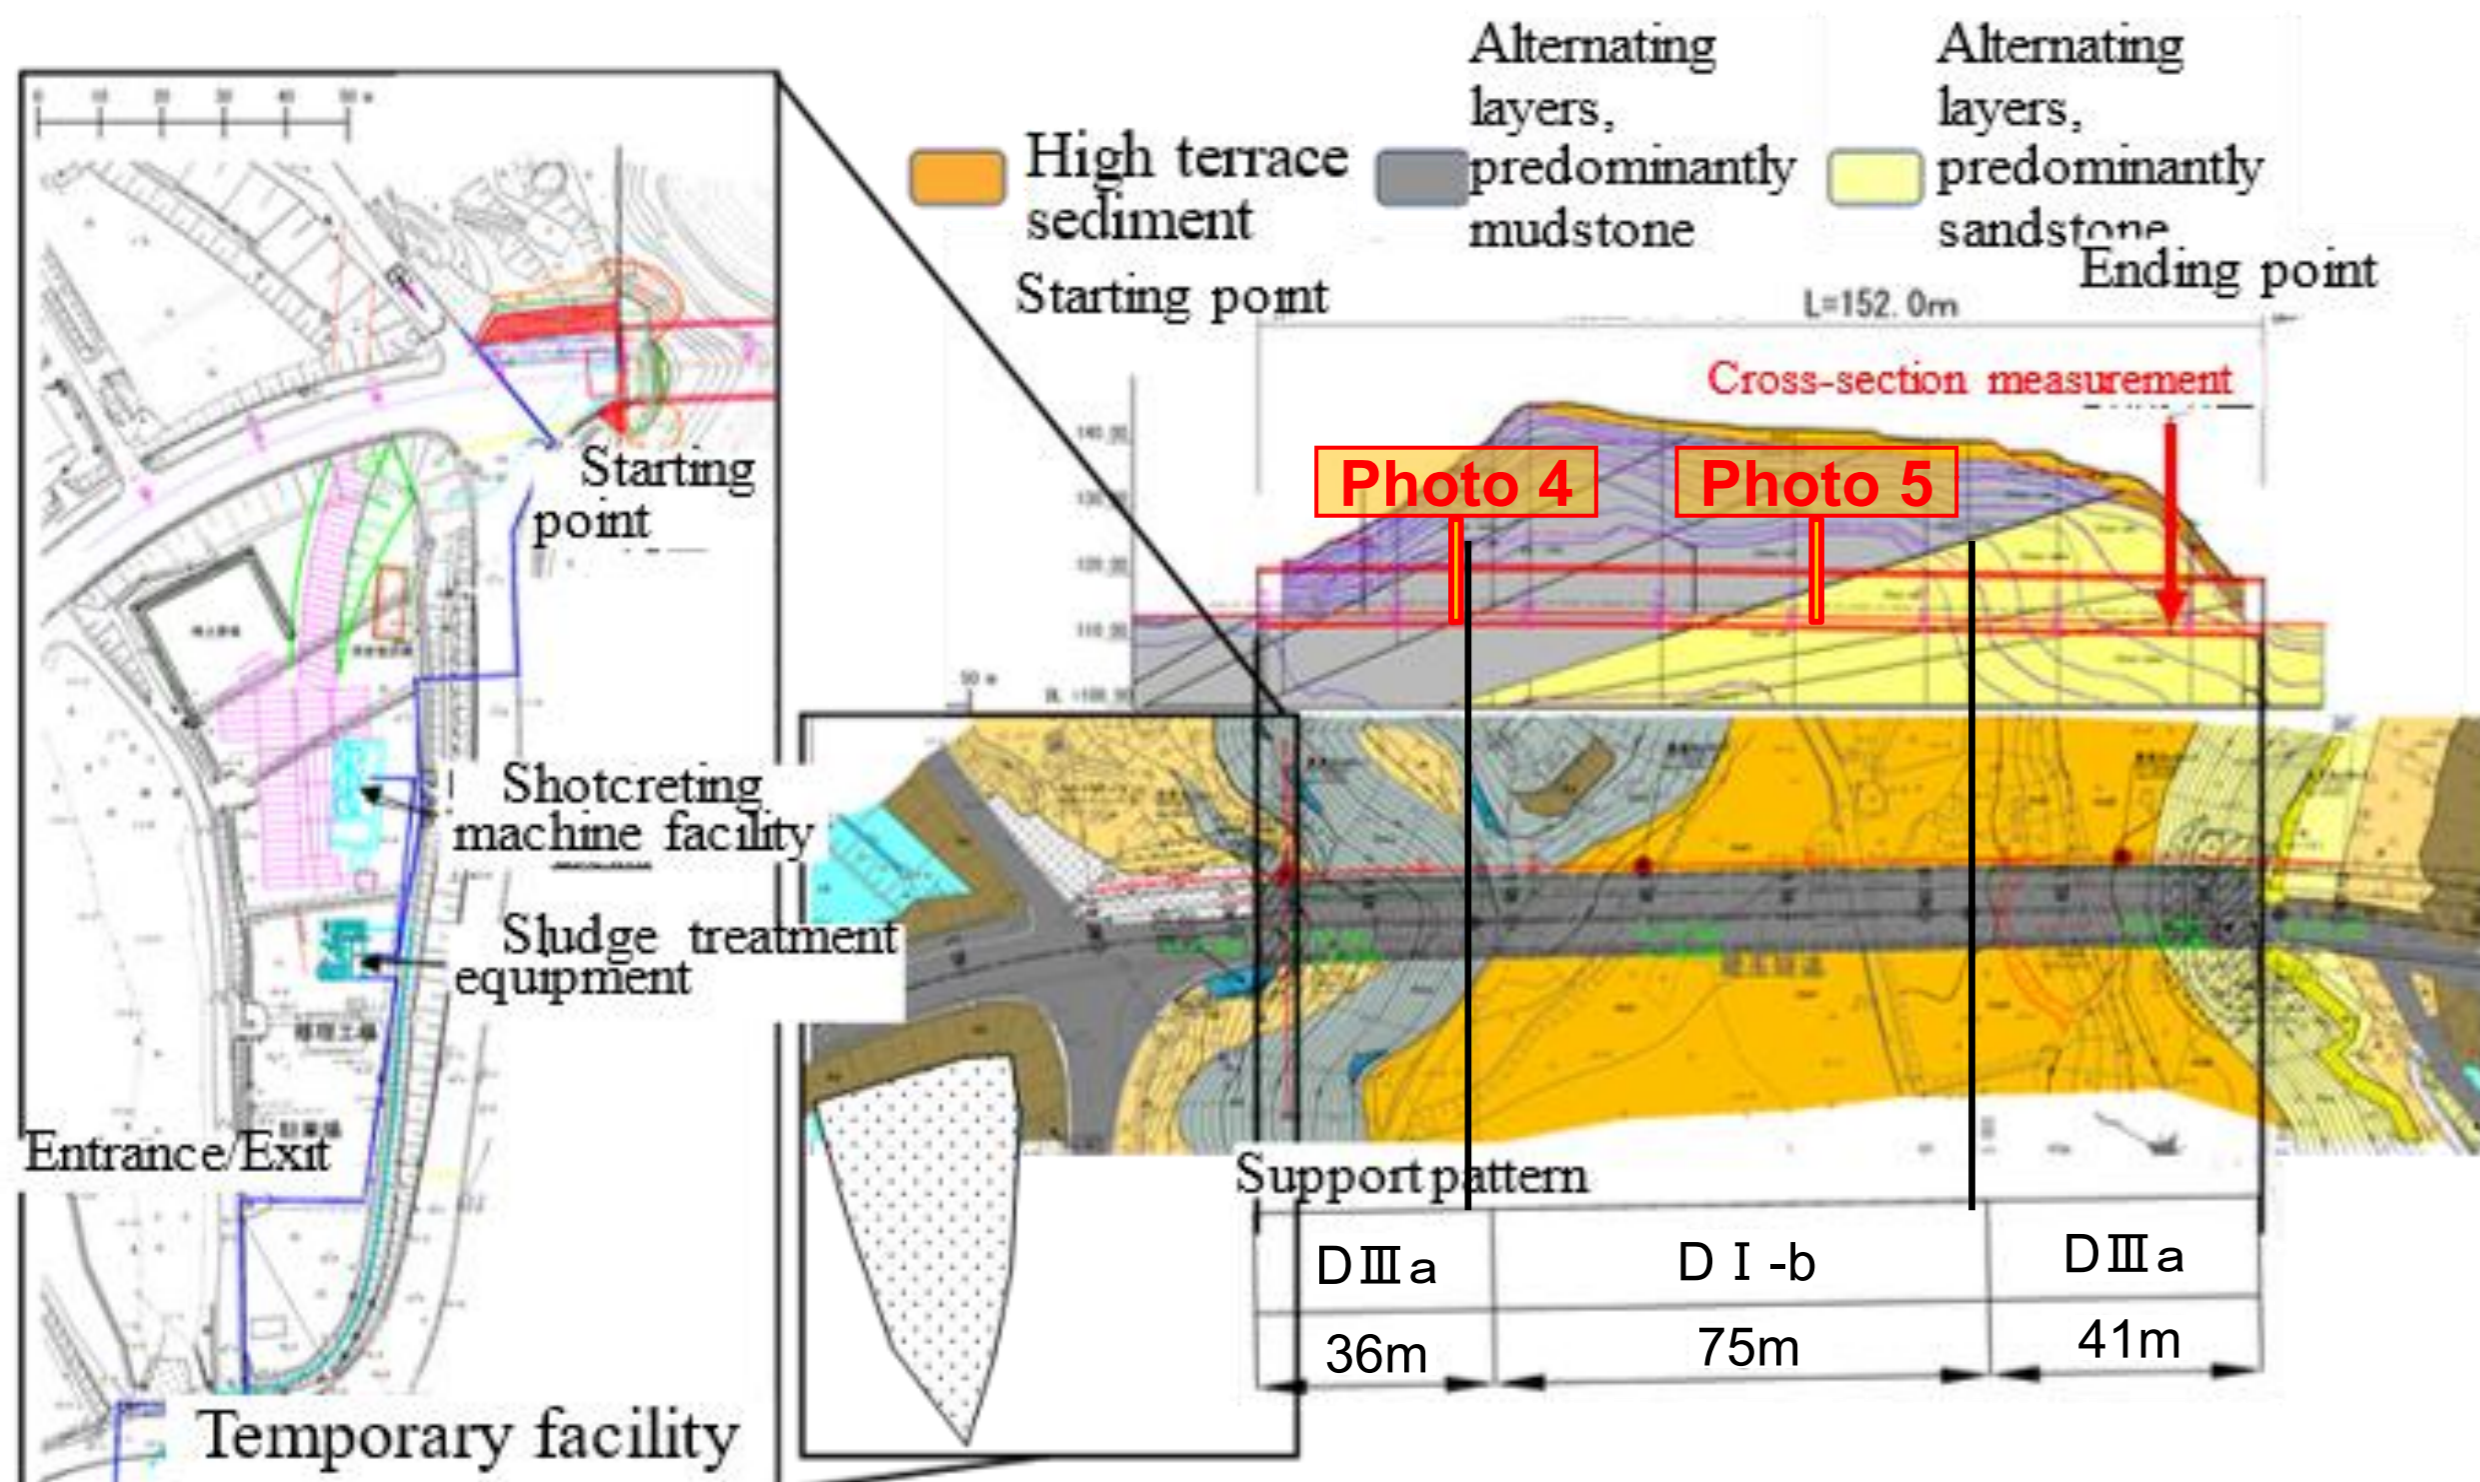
Temporary yard (plan view); soil characteristics (vertical section)
